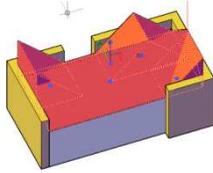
Solid primitives used to build 3D roof model in AutoCAD
